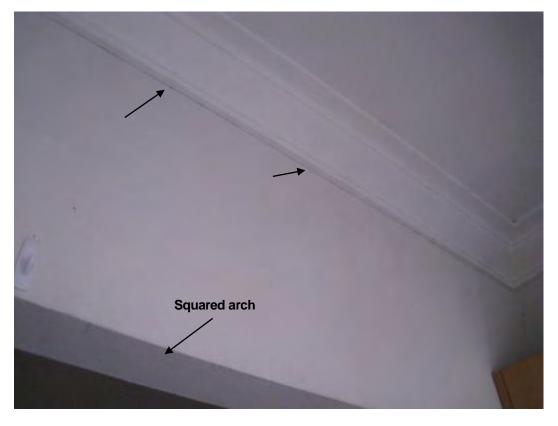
shows flaking paint to the cornice and ceiling to the southern corner of Bedroom 3
